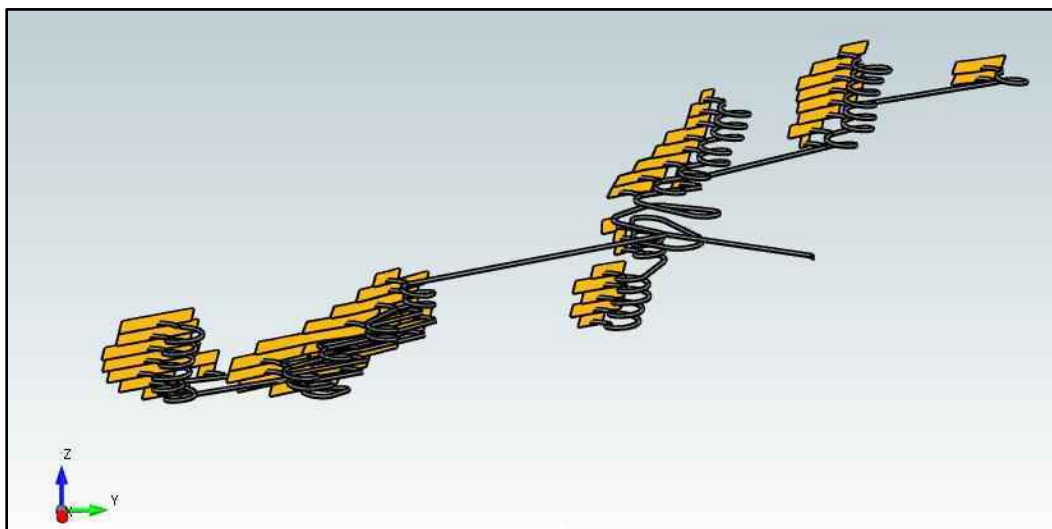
Babicanora Sur and Babicanora Sur HW Development – Section View (Looking North)
